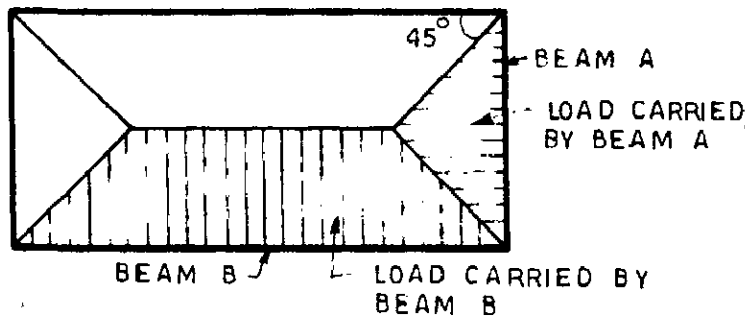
LOAD DISTRIBUTION ON BEAMS
